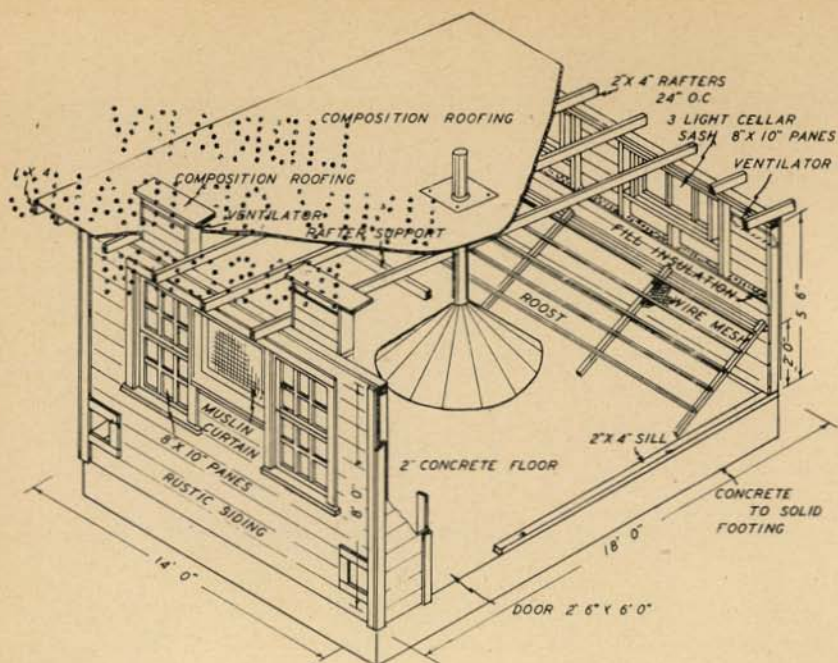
Shed roof type brooder house with concrete floor and foundation. Note double sash windows in front, ventilators at front and rear plates, and door in the southeast corner.
